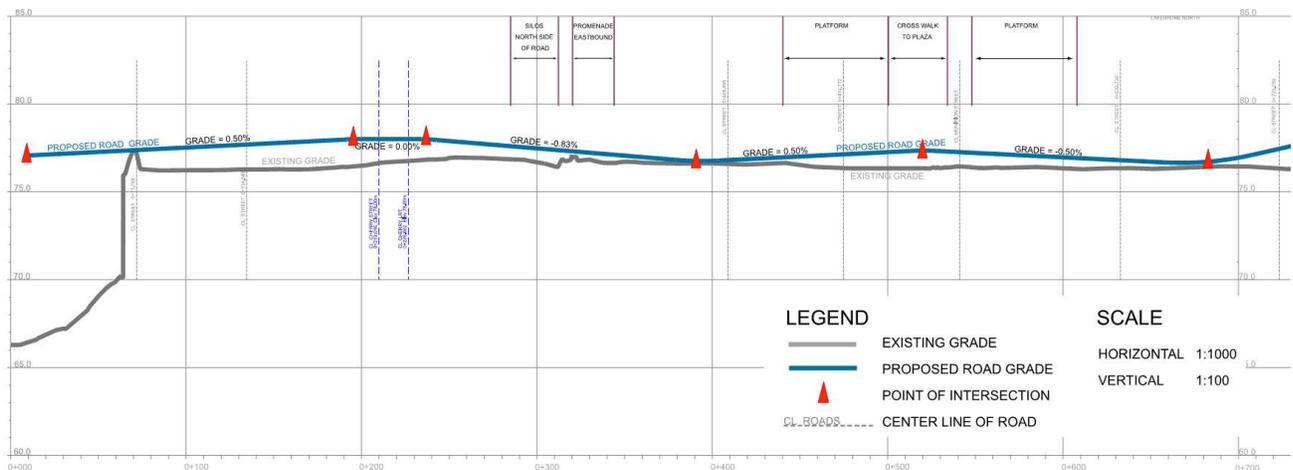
Commissioners Street Vertical Road Profile
